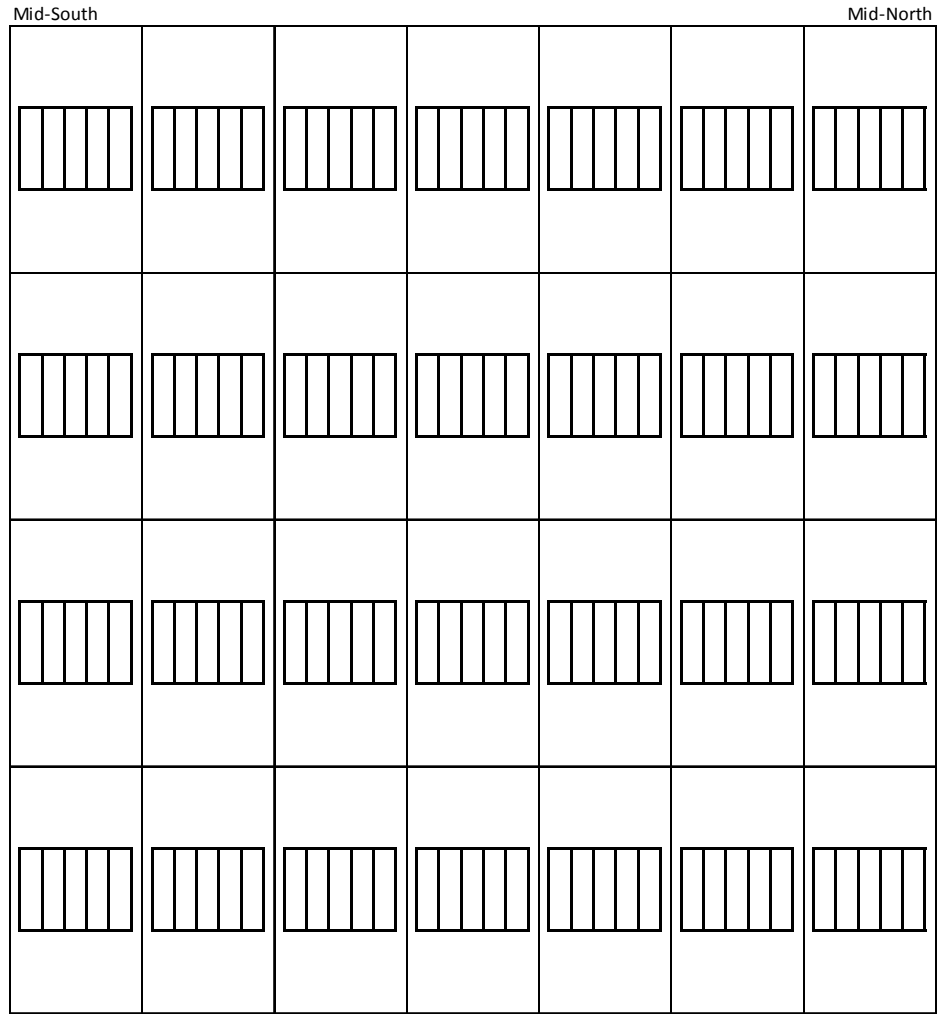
DIA16R: Fastener failures during inelastic test (4/5)
